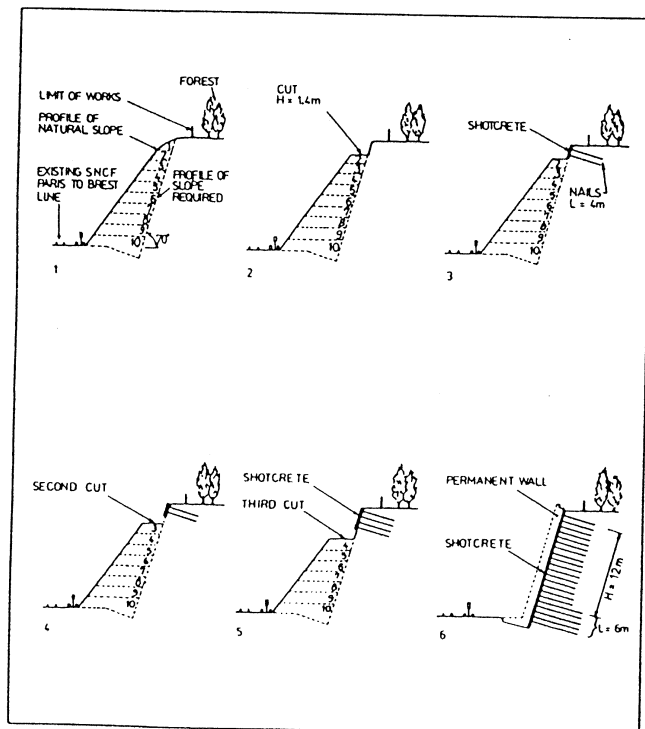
Retaining wall construction, A9 Autoroute, France (Bonazzi and Colombet, 1984)
